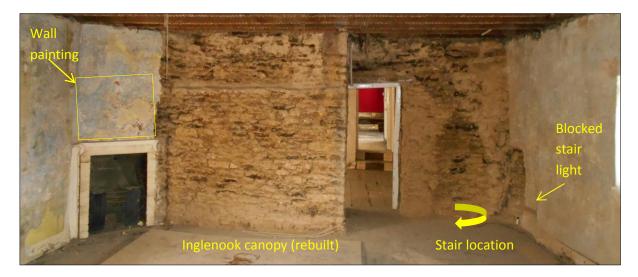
the south side of room F3; fireplace and wall-painting to left, stair to right
